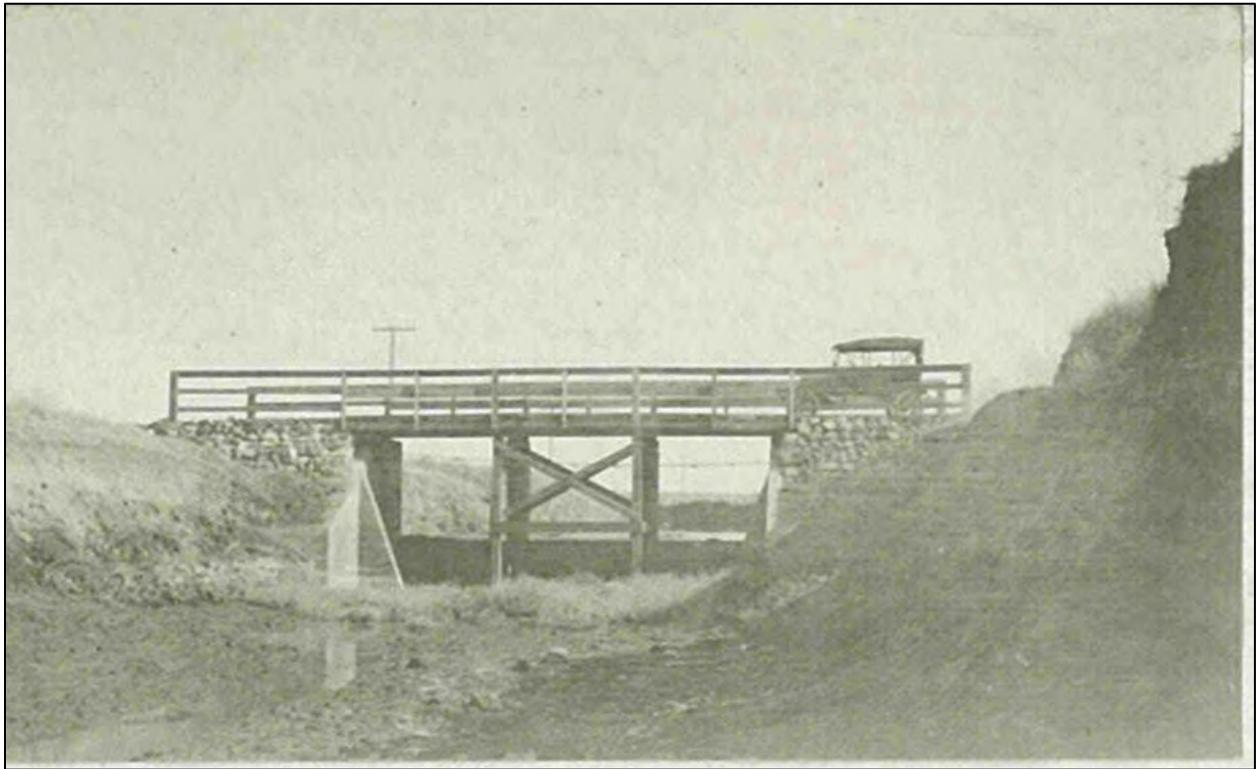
A timber bridge across a check on the Minidoka Project (Idaho).³²⁶
